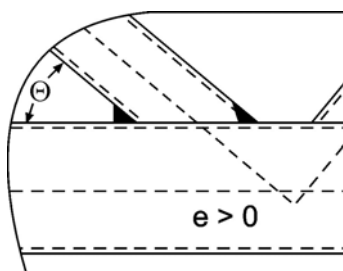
The end of the brace member must be bevelled if the joint angle is $\theta \leq 60^\circ$. In this case, the brace member facing the gap must be bevelled and the weld is made as a butt weld to a semi-V groove (Yrjölä 2008).
